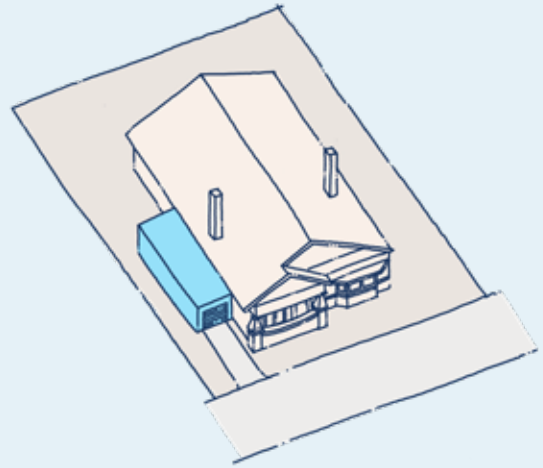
Dwelling, Drumcondra. A recessive garage to a dwelling.
